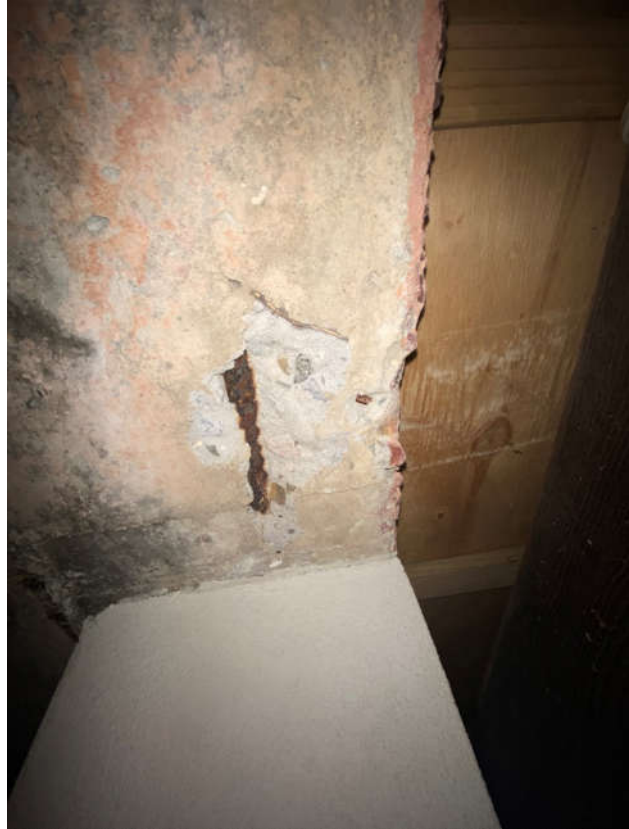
Spalling ground floor slab and exposed corroded reinforcement
